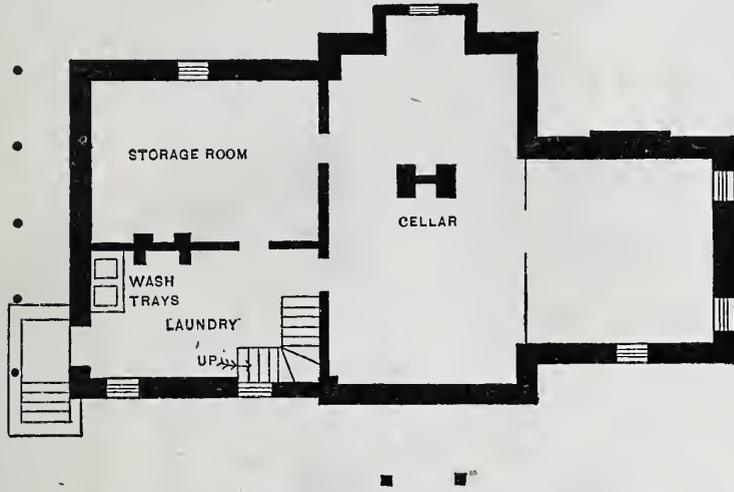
Foundation Plan.—Scale, 1-16 Inch to the Foot.
